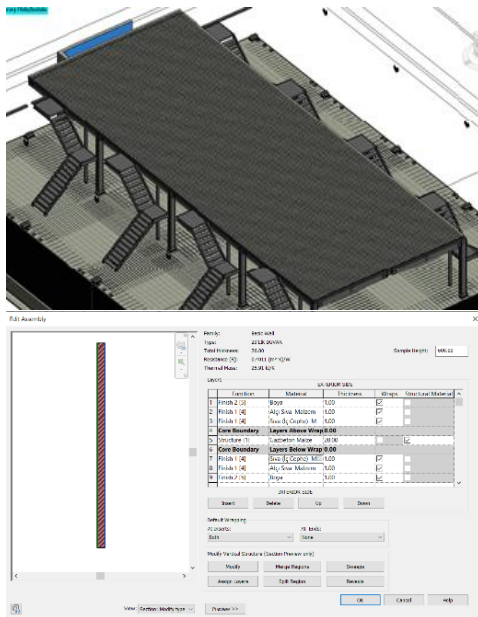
Composite Structural System Modeling on the Mezzanine Floor.
